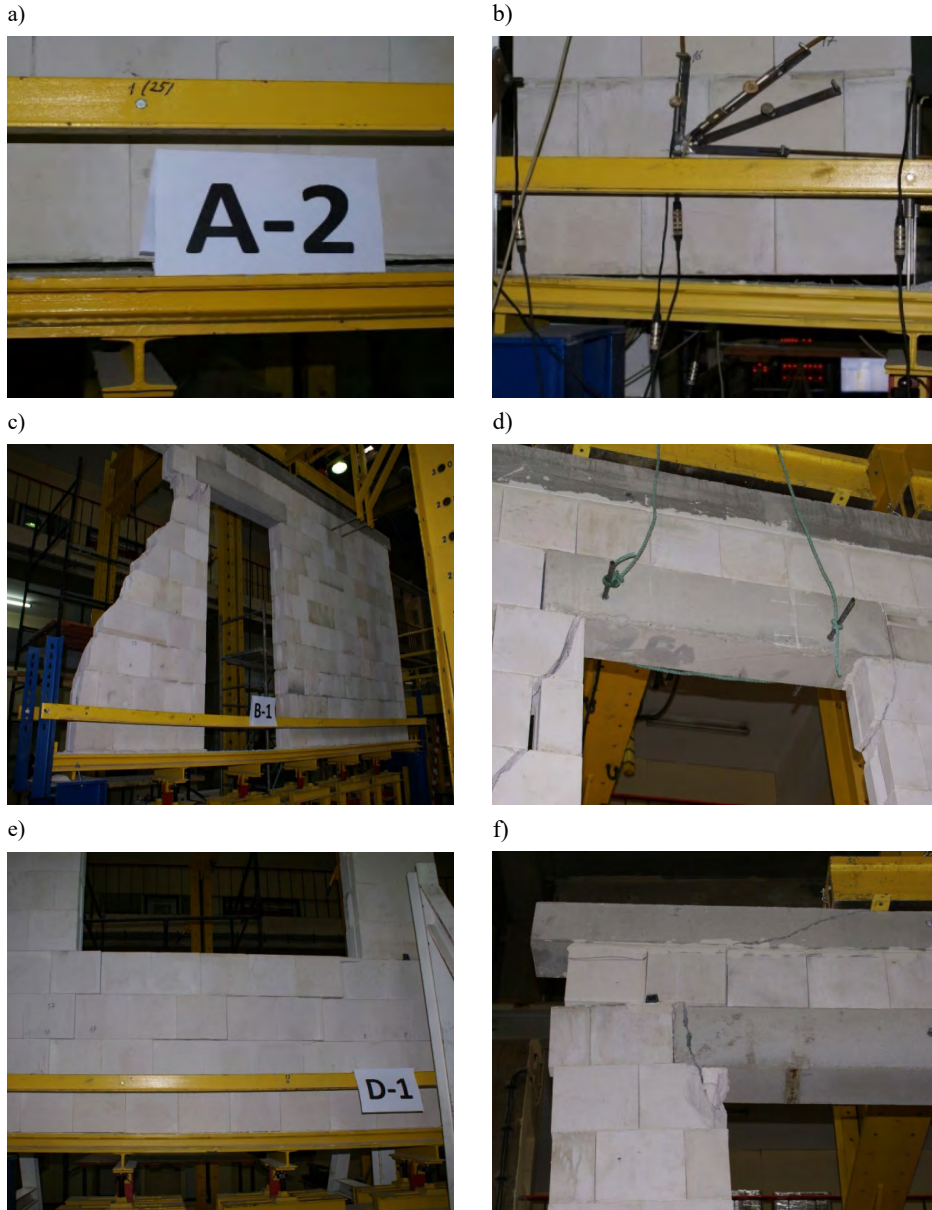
Photographs of most common ways of cracking and failure of the walls: a) detachment of the lower edge of the A-2 wall, b) detachment of the lower part of the outer pillar of the C-1 wall, c) destruction of the pillar in the B-1 wall, d) destruction of the B-2 wall under the lintel, e) cracks in the wall D-1 under the window opening, f) failure of the outer pillar in the D-2 wall under the lintel. *Source:* the author's own study
